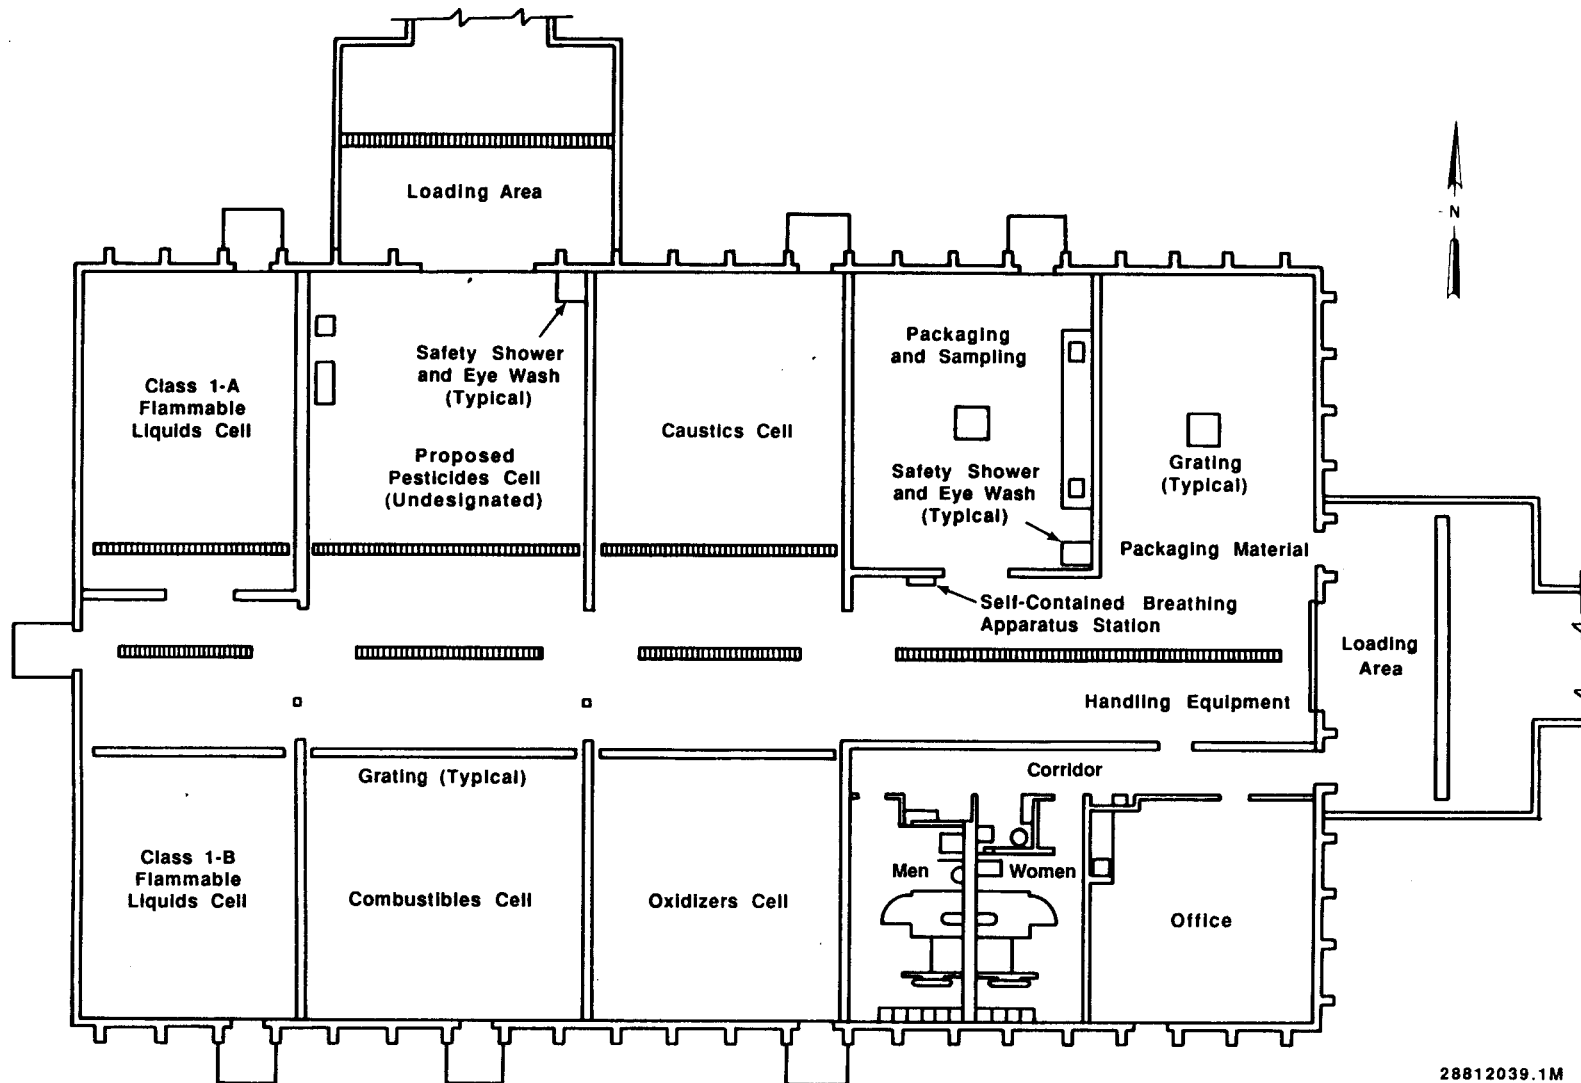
Nonradioactive Dangerous Waste Storage Facility Floor Plan.
